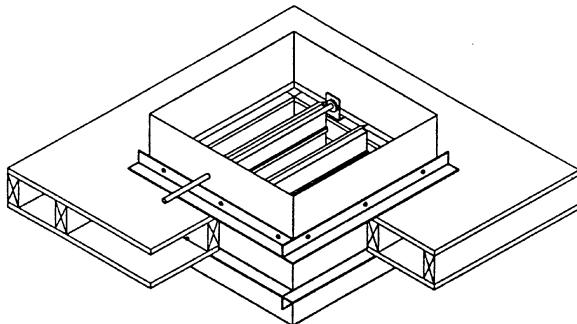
ACTUATOR ABOVE RATED CORRIDOR CEILING
